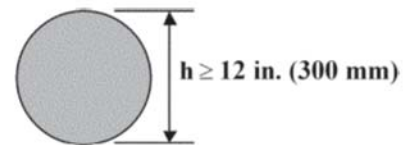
Minimum cross-sectional dimension for circular columns.
